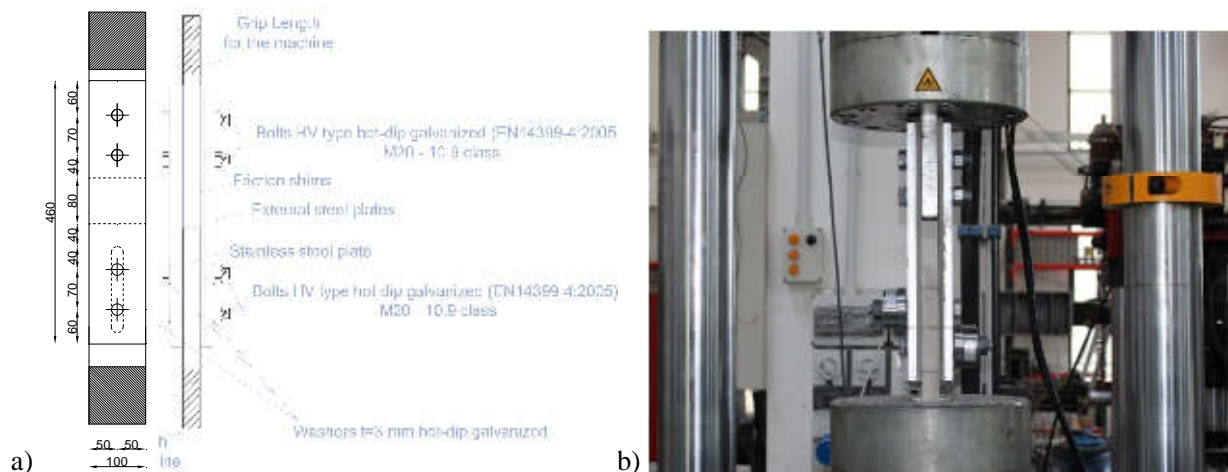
a) Typical specimen; b) Specimen in the machine
